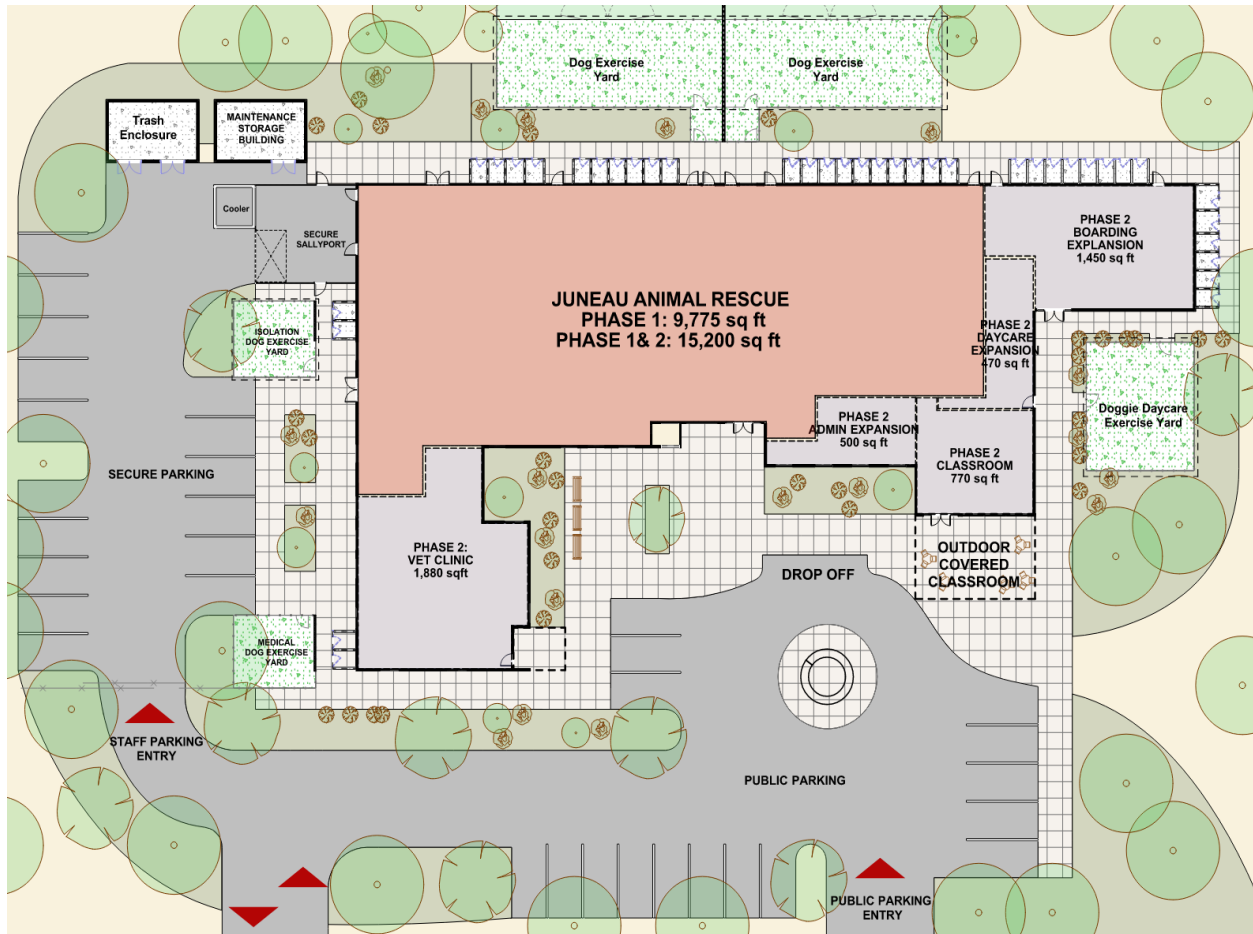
New Purpose-Built Shelter Hypothetical Site Plan
